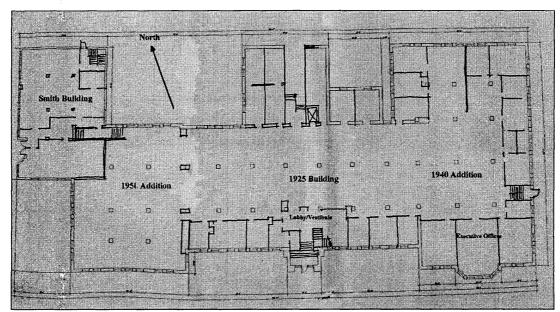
First floor floor plan (M+ Architects, Sioux City)
